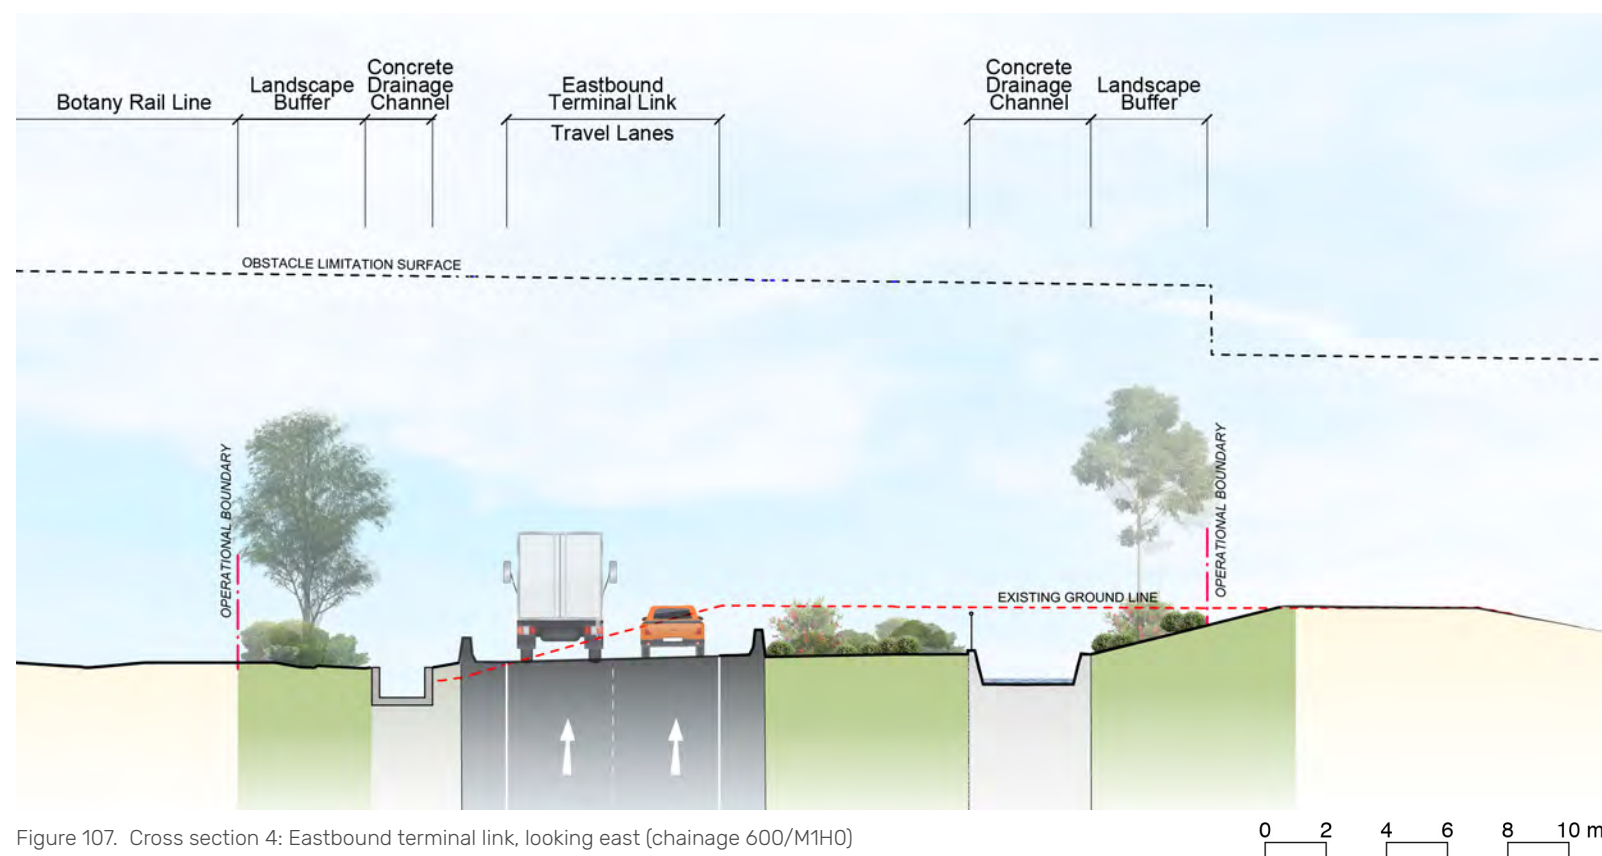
Cross section 4: Eastbound terminal link, looking east (chainage 600/M1H0)
